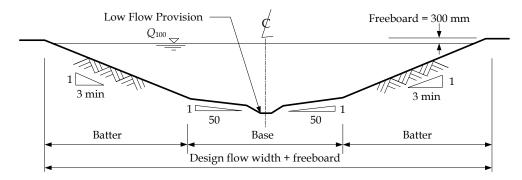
Typical Grassed Channel Cross-Section (Modified from ACT Government, 1992)
